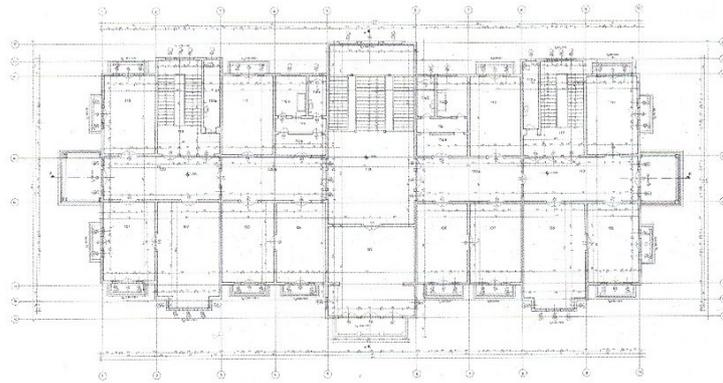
Ahmed Ratib Paşa Mansion First floor plan by drawing Ali Hacıhaliloğlu (Yavuz, Y. 2009a: 89-90)
